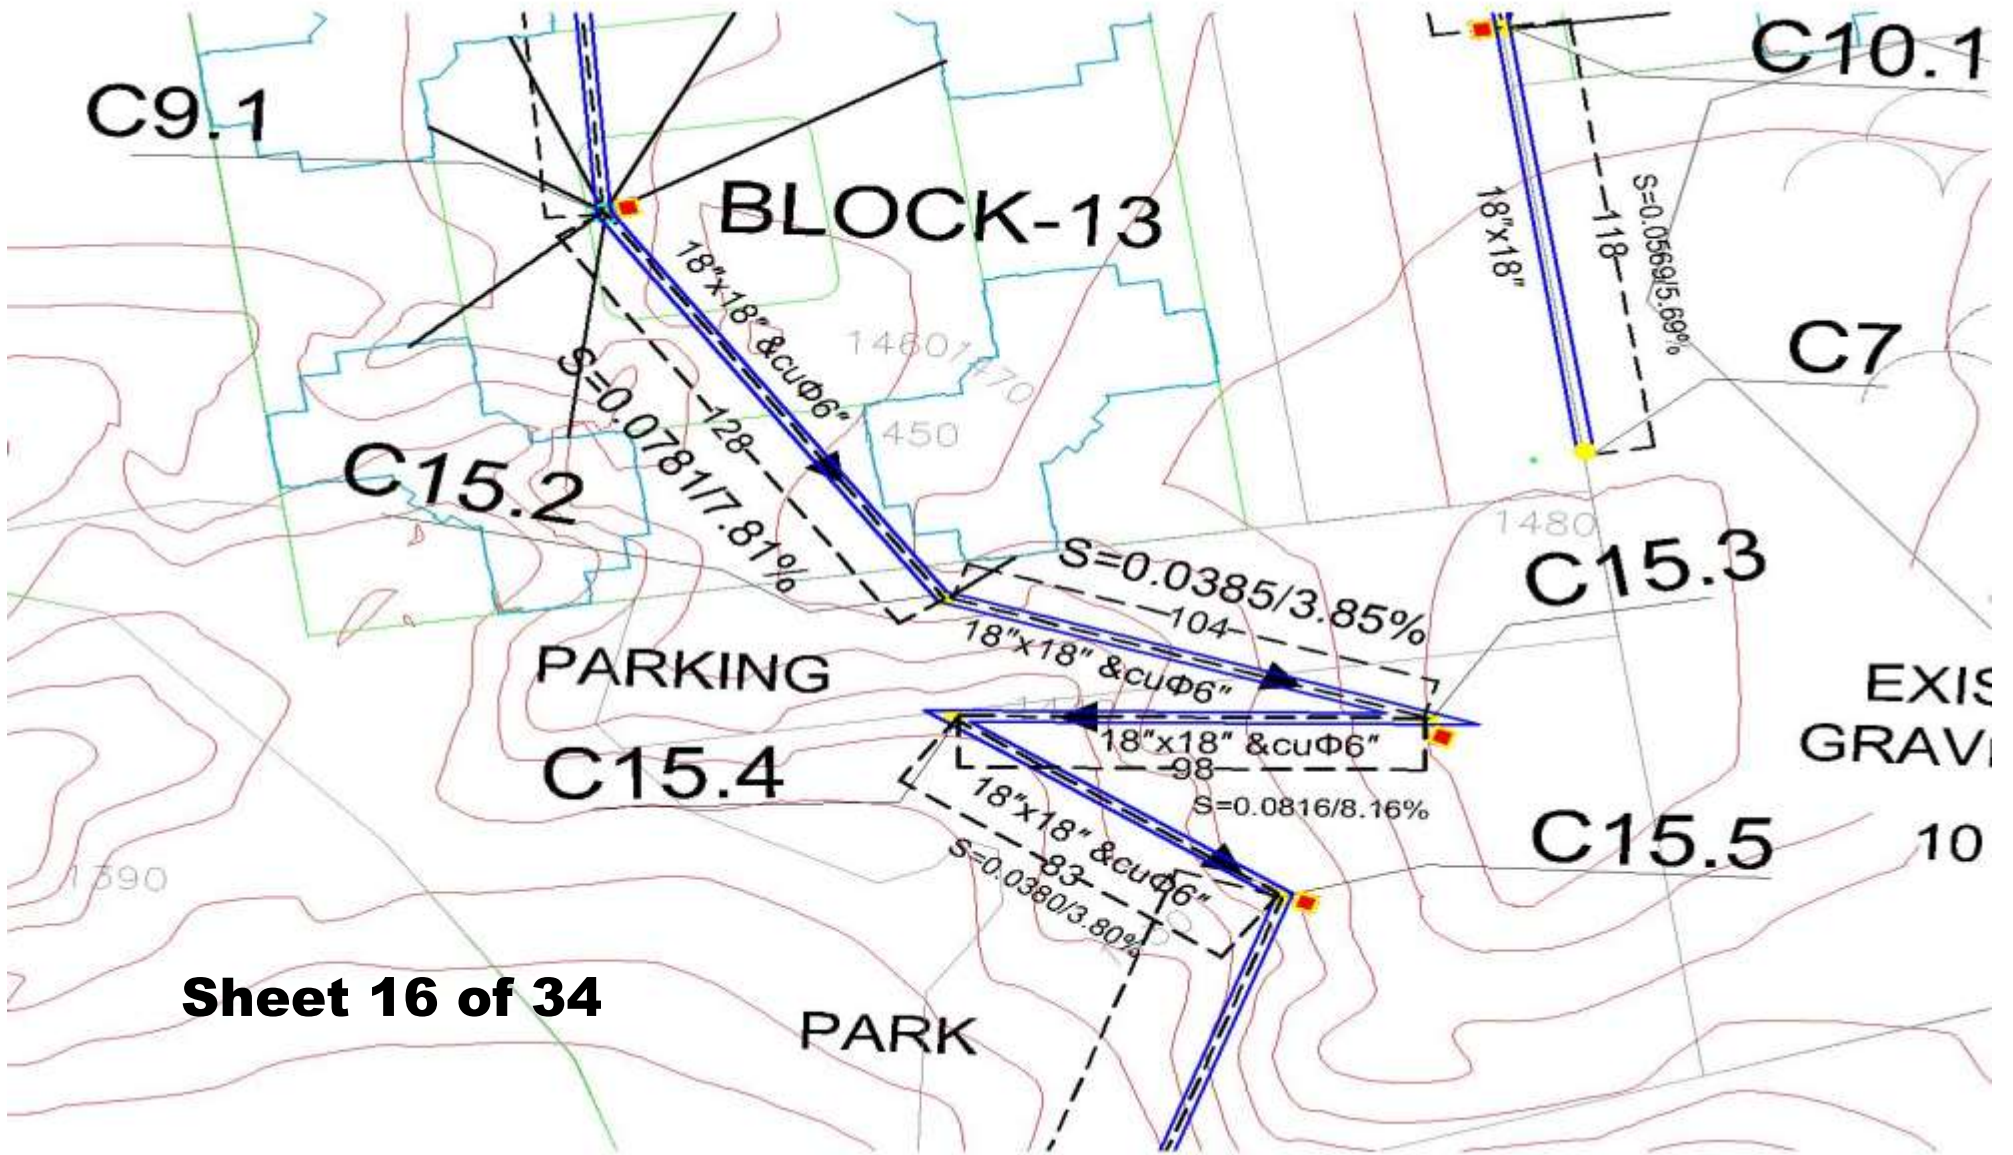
Combined drainage layout plan of Zone-3 exit from Block-13 & 14
